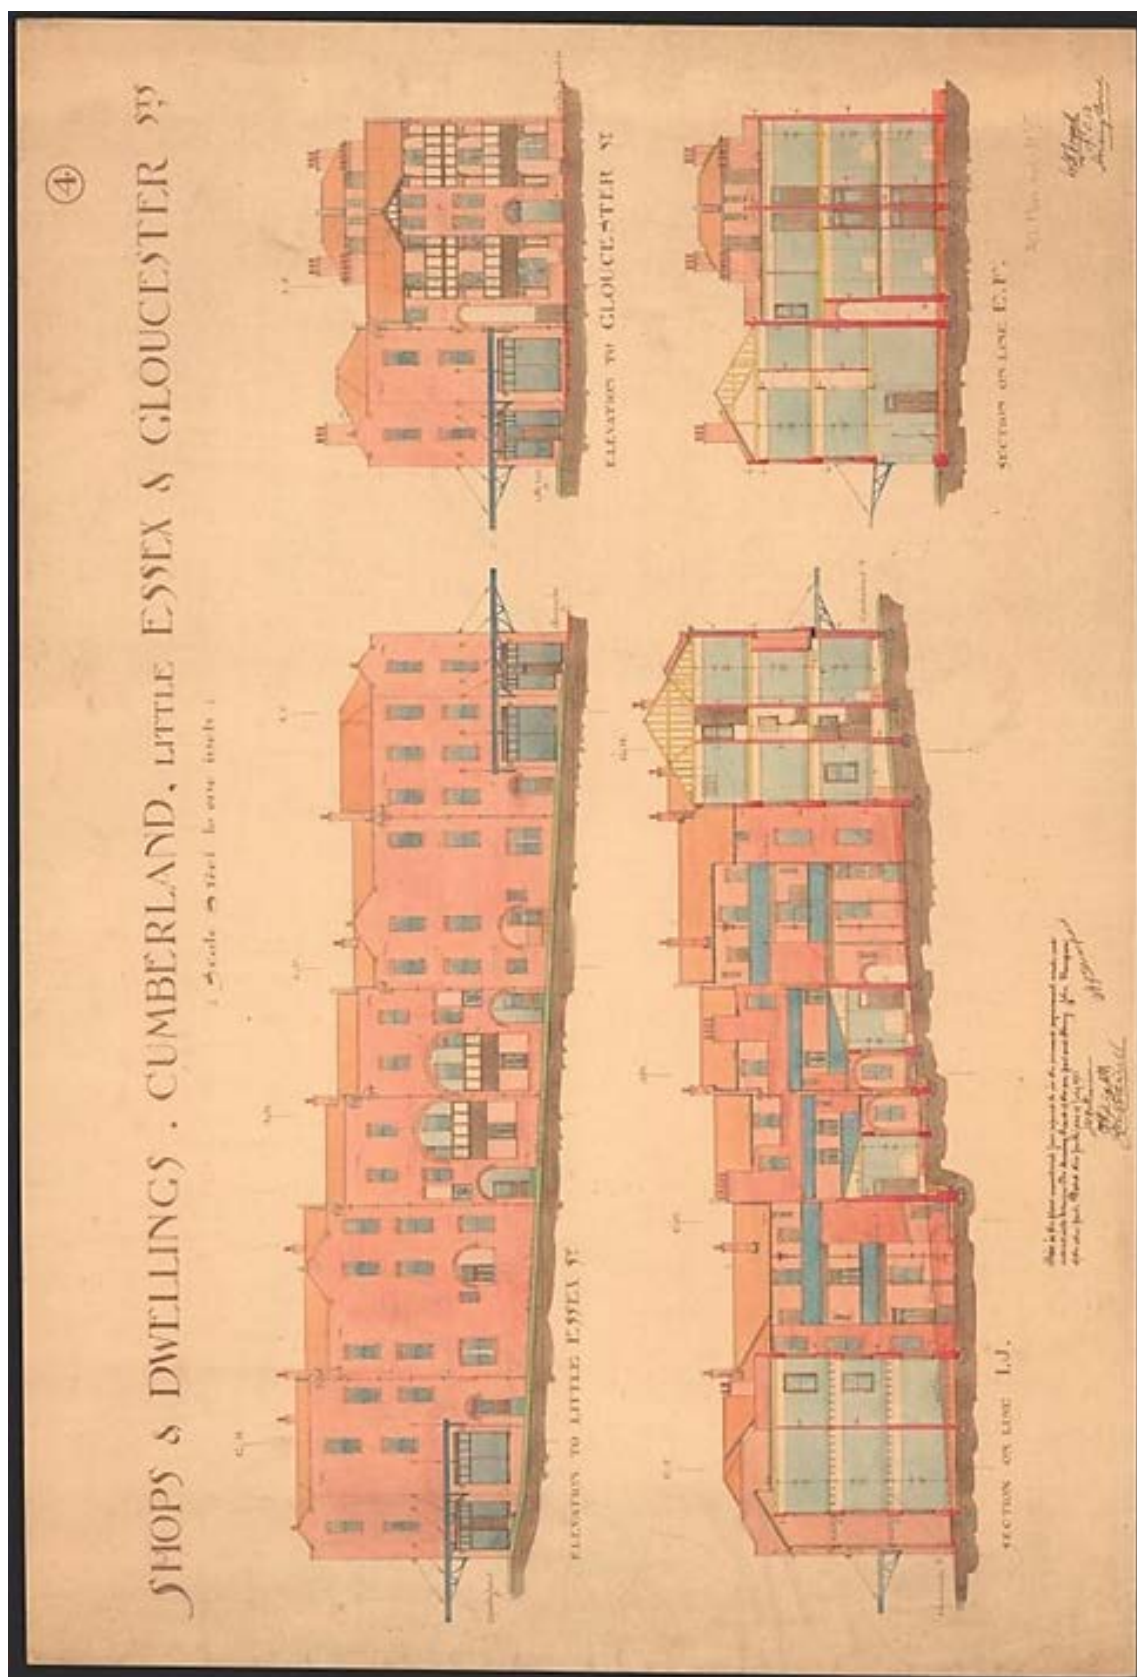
Essex and Gloucester Streets elevations and section for Shops & Dwellings, Cumberland, Little Essex & Gloucester Streets, The Rocks, Housing Board, Architect Foggitt dated May 1913, Source: State Records NSW, Plan No. 3135.
